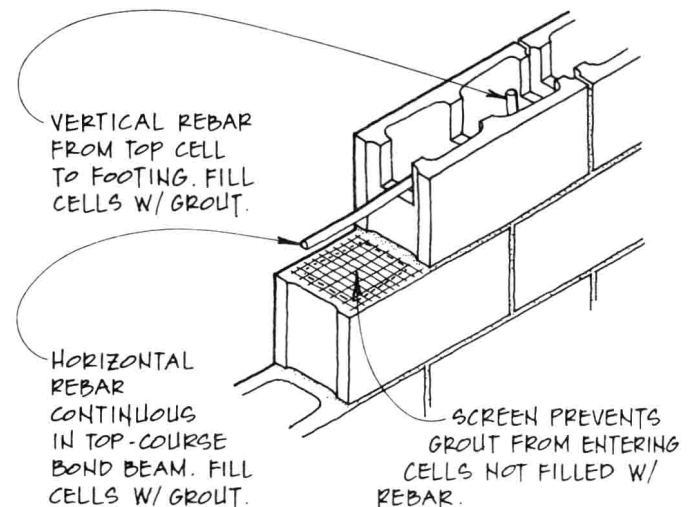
Where lateral forces exerted by soils are high or earthquakes are possible, CMU can be reinforced vertically and horizontally. Vertical rebars are easily inserted into block cores and grouted in place. Horizontal rebars are grouted in continuously in the top course of CMU, forming a bond beam. Intermediate bond beams can be used if required.
